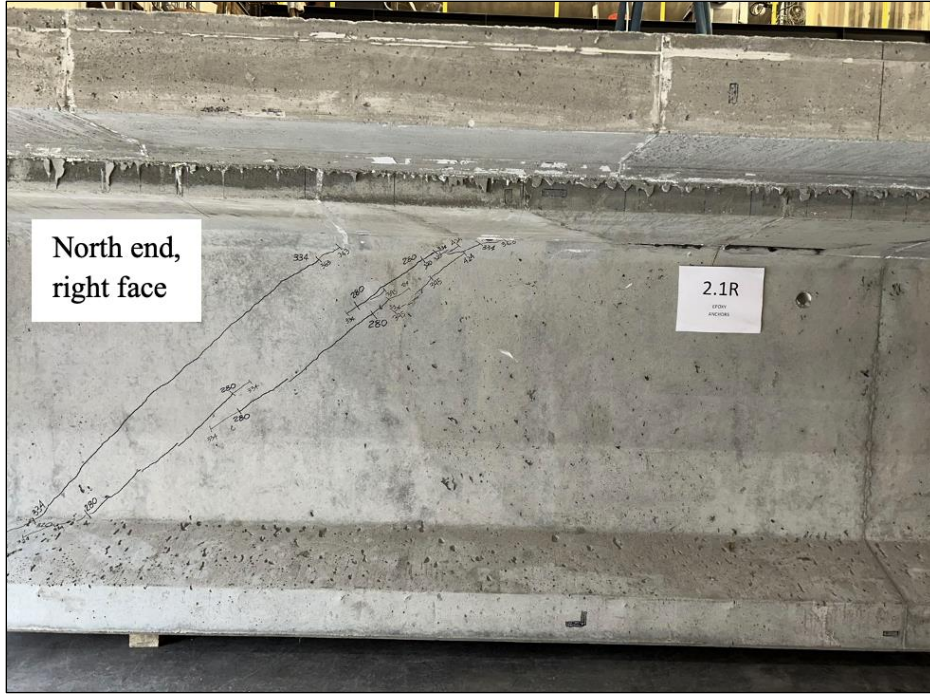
Photo. Test 2.1.S (repair 2.1RTF, 2.1LTF) final shear cracks not spreading to top flange repair 2.3RTF at 424 kip (right face of girder pictured).
